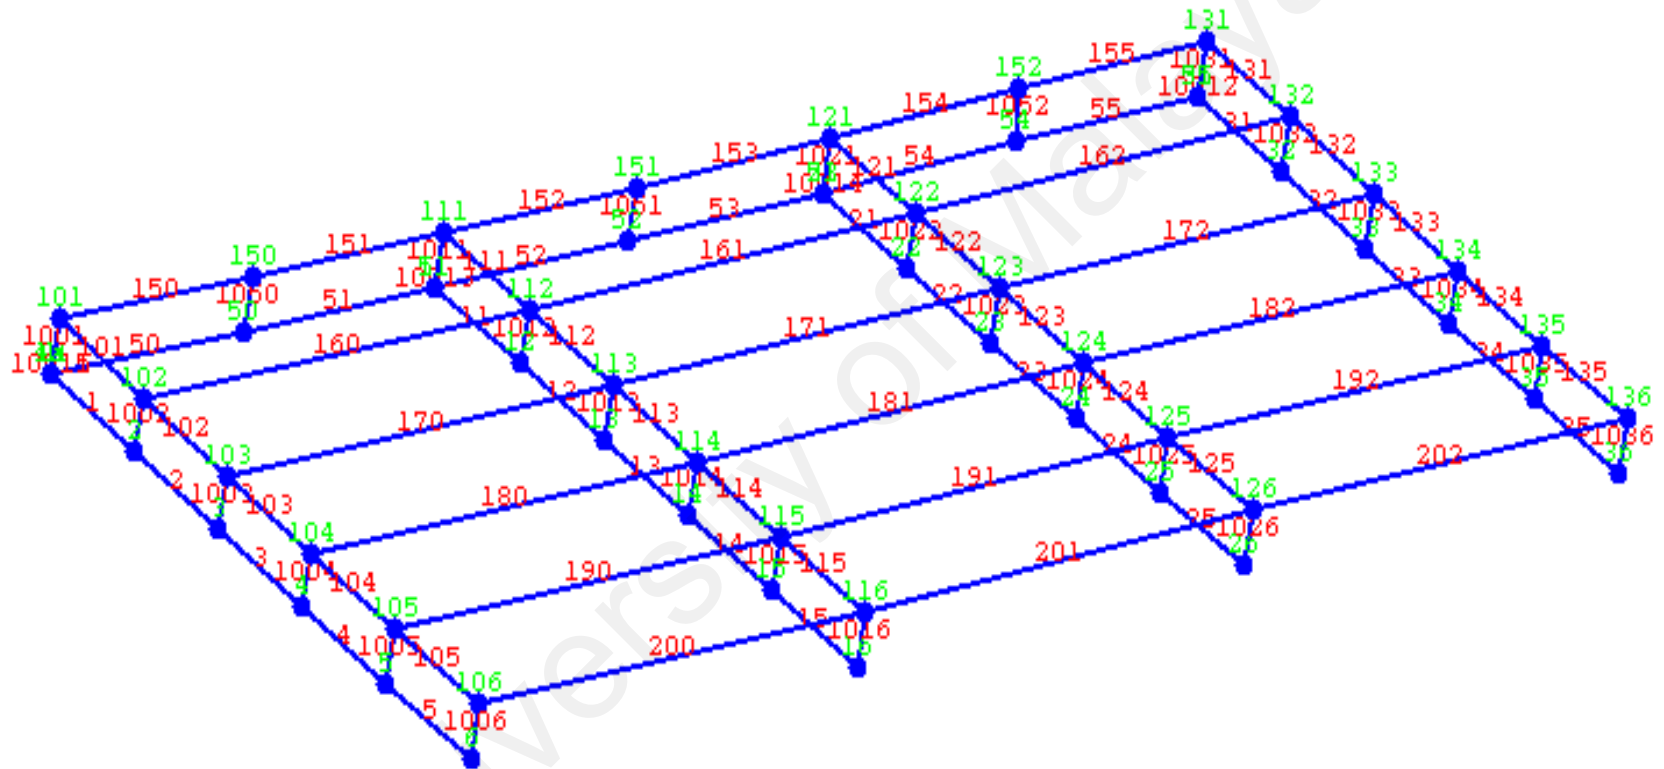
Grillage modelling of floor system, (Half of compartment for Panel 1, 2 and 3)
